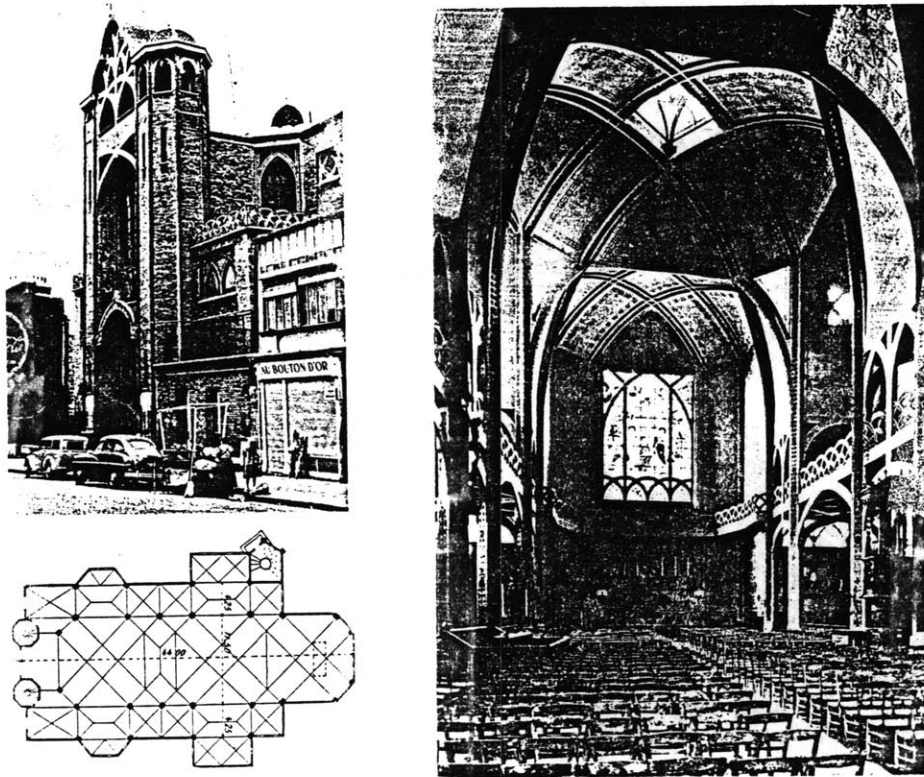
The Exterior, plan, and interior view of St-Jean de Montmartre
